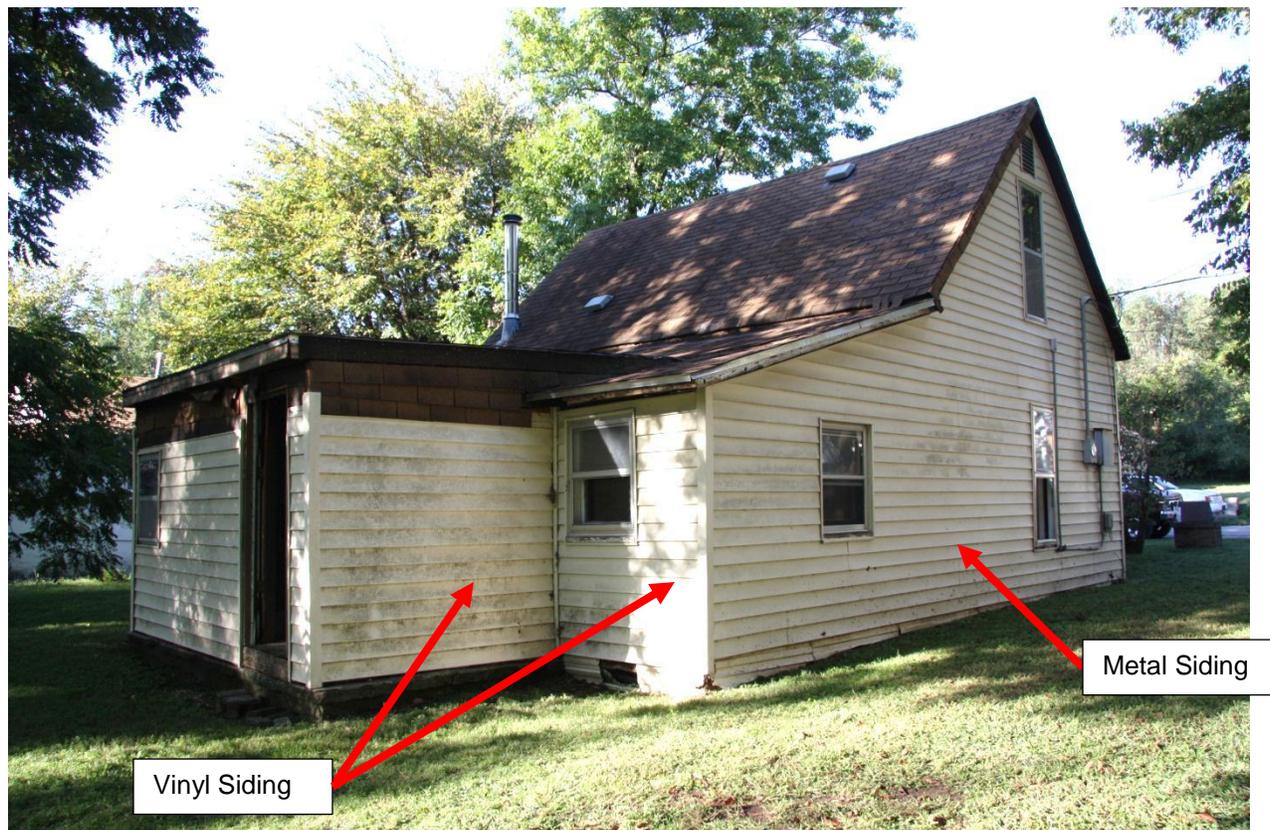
East and north exterior walls, looking southwest. (SRJA 2011)
